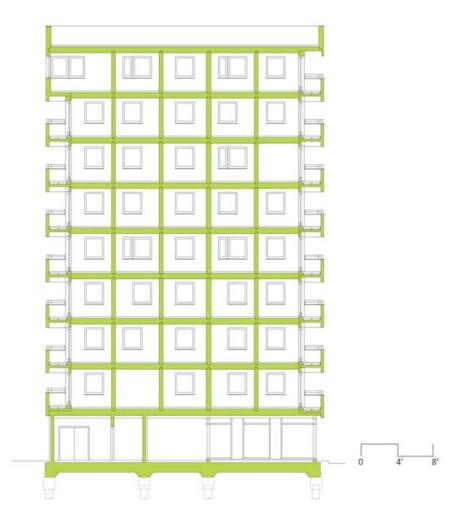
Building Section of the Murray Grove in Hackney http://www.architectmagazine.com/detail/murray-grove.aspx
